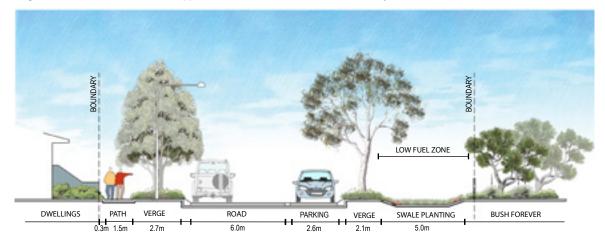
Access Street C Typical Cross Section (source: Emerge Associates)
